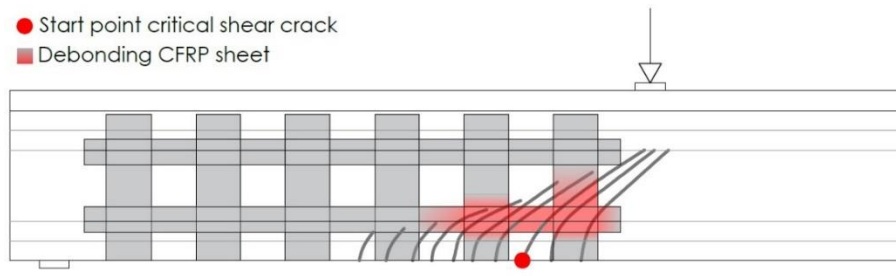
Debonding CFRP sheets specimen I-VH-SP4 at load step 60
